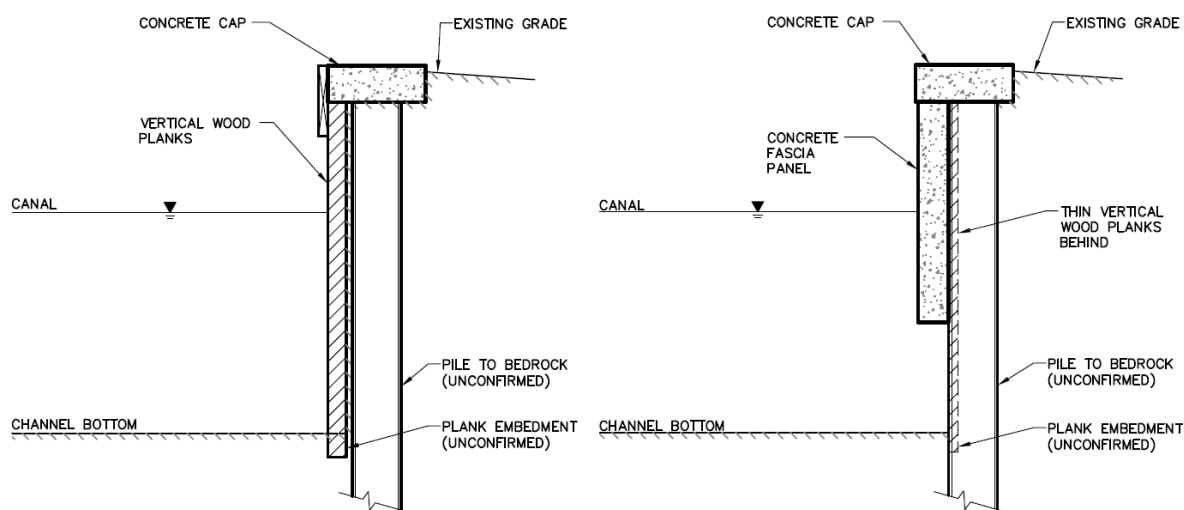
Typical Shorewall Construction: a) Wood Plank; b) Concrete Fascia
